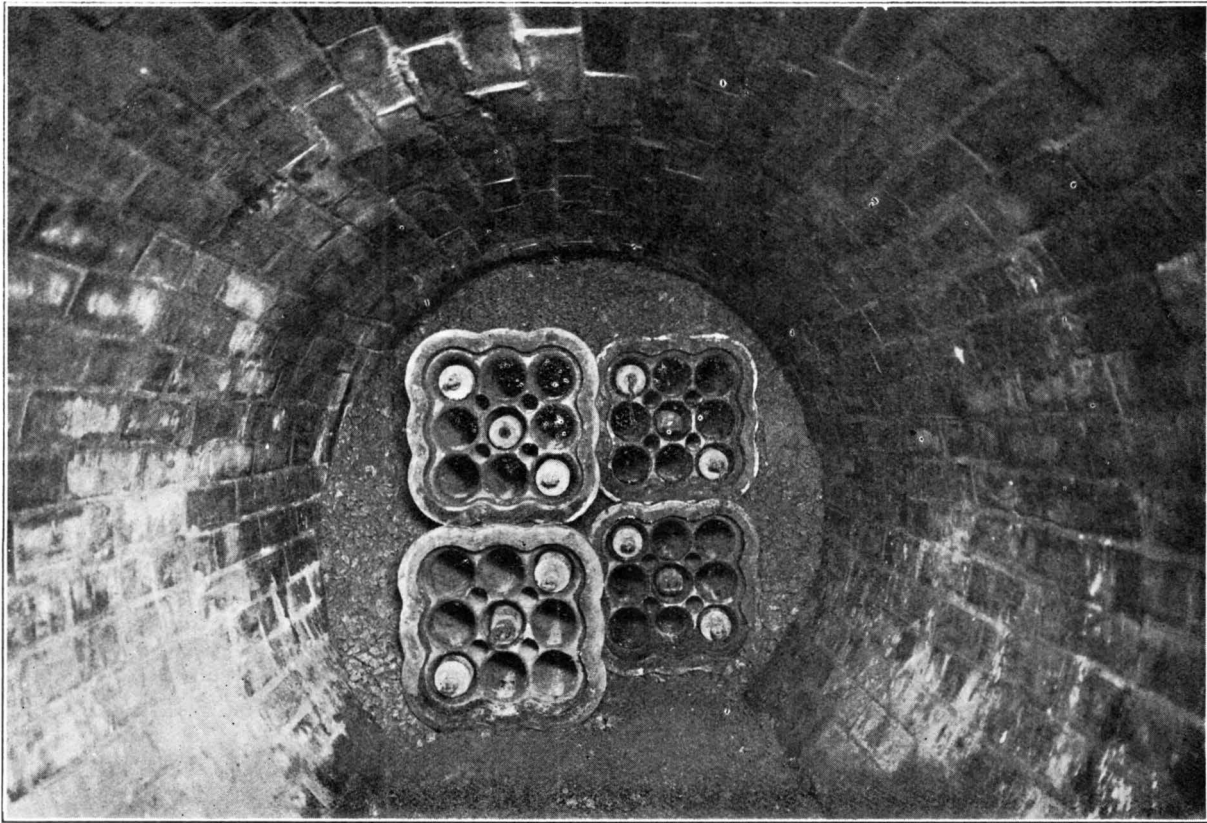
TUNNEL UNDER MANCHESTER-ROCHDALE CANAL: SUBWAY COMPLETED AND DUCT LAYING IN PROGRESS.
